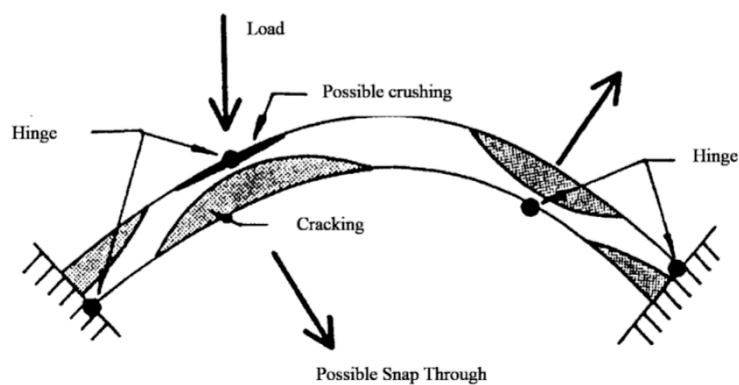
Failure modes in masonry arch bridges (Sarhosis et al, 2016)
